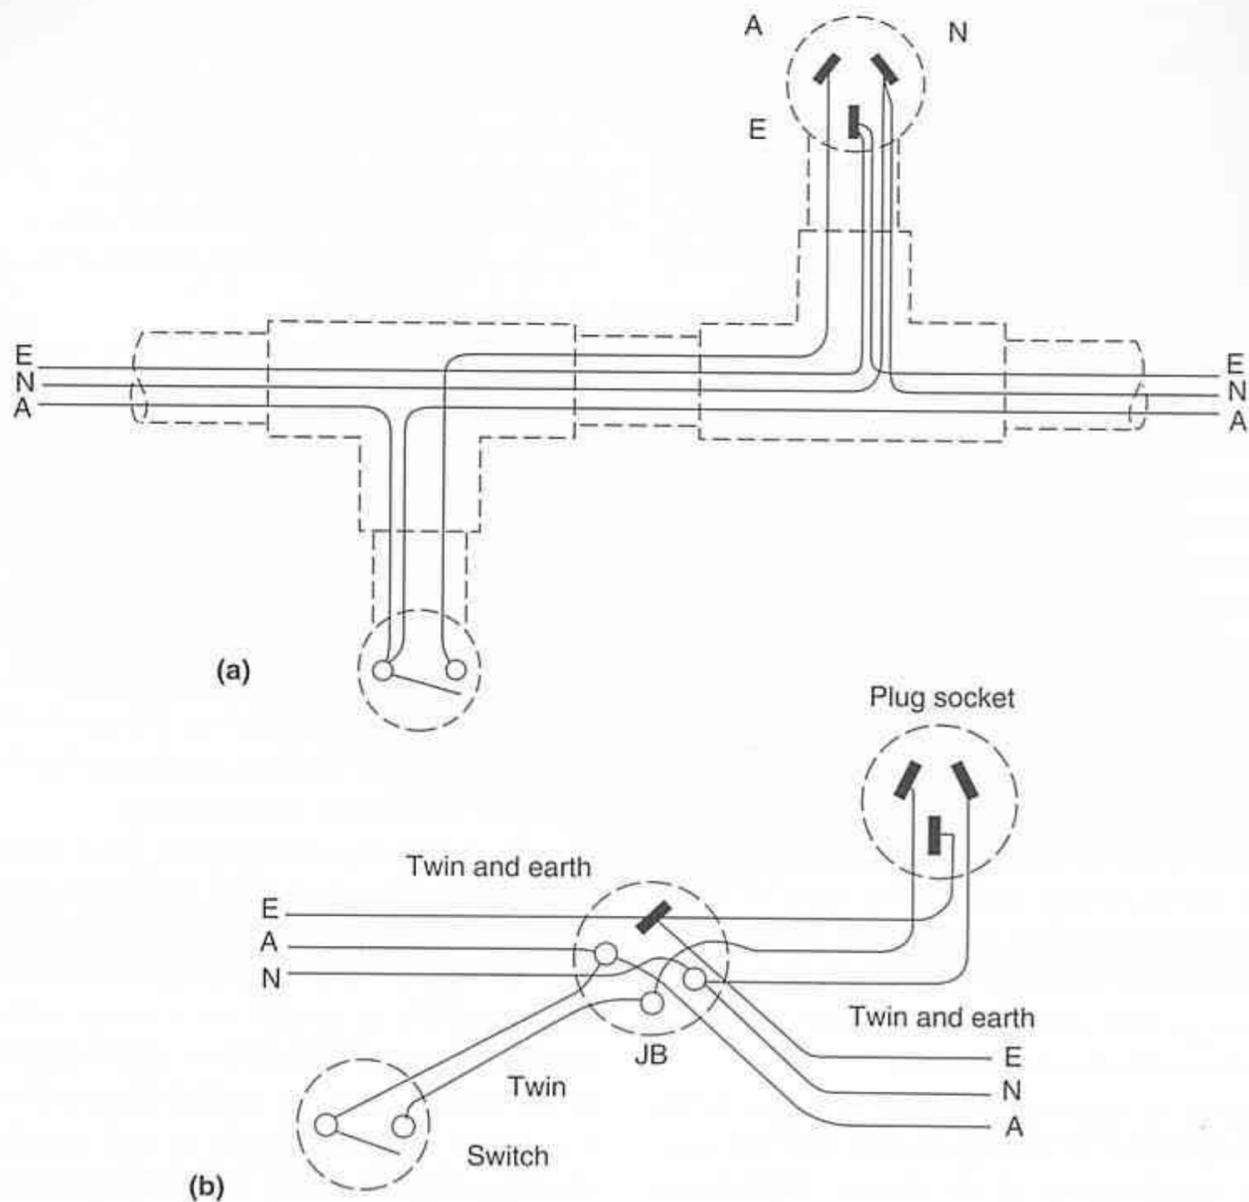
A power outlet may be controlled by a switch up to 1.5 m distant from the outlet, provided that the outlet is visible from the switch
